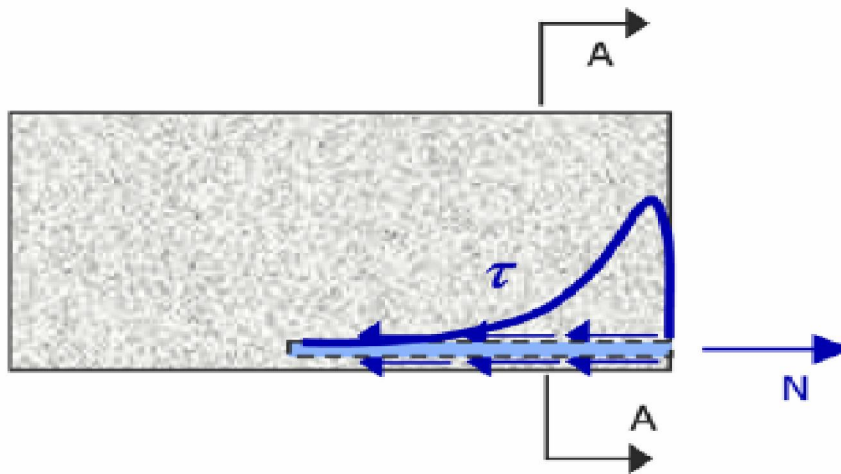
The bond stresses in the longitudinal plane[1]
